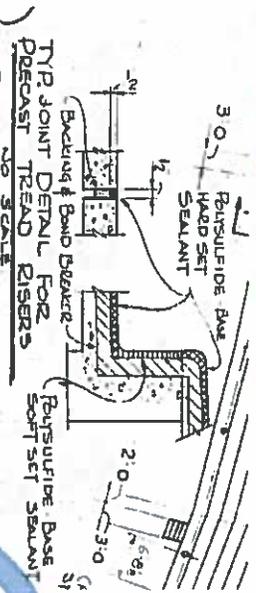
Precast Riser Joint Sealant Details - Vertical Joint
